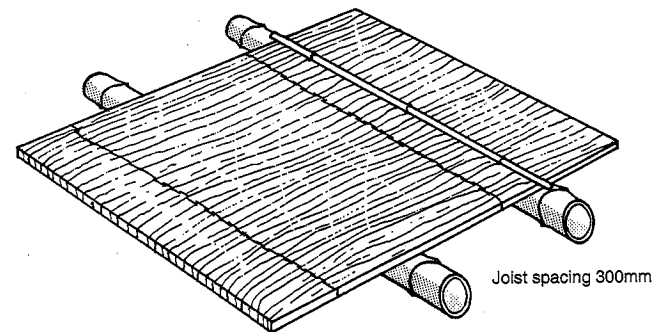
Joist arrangement - primaries only (after Siopongco et al. 1987)
